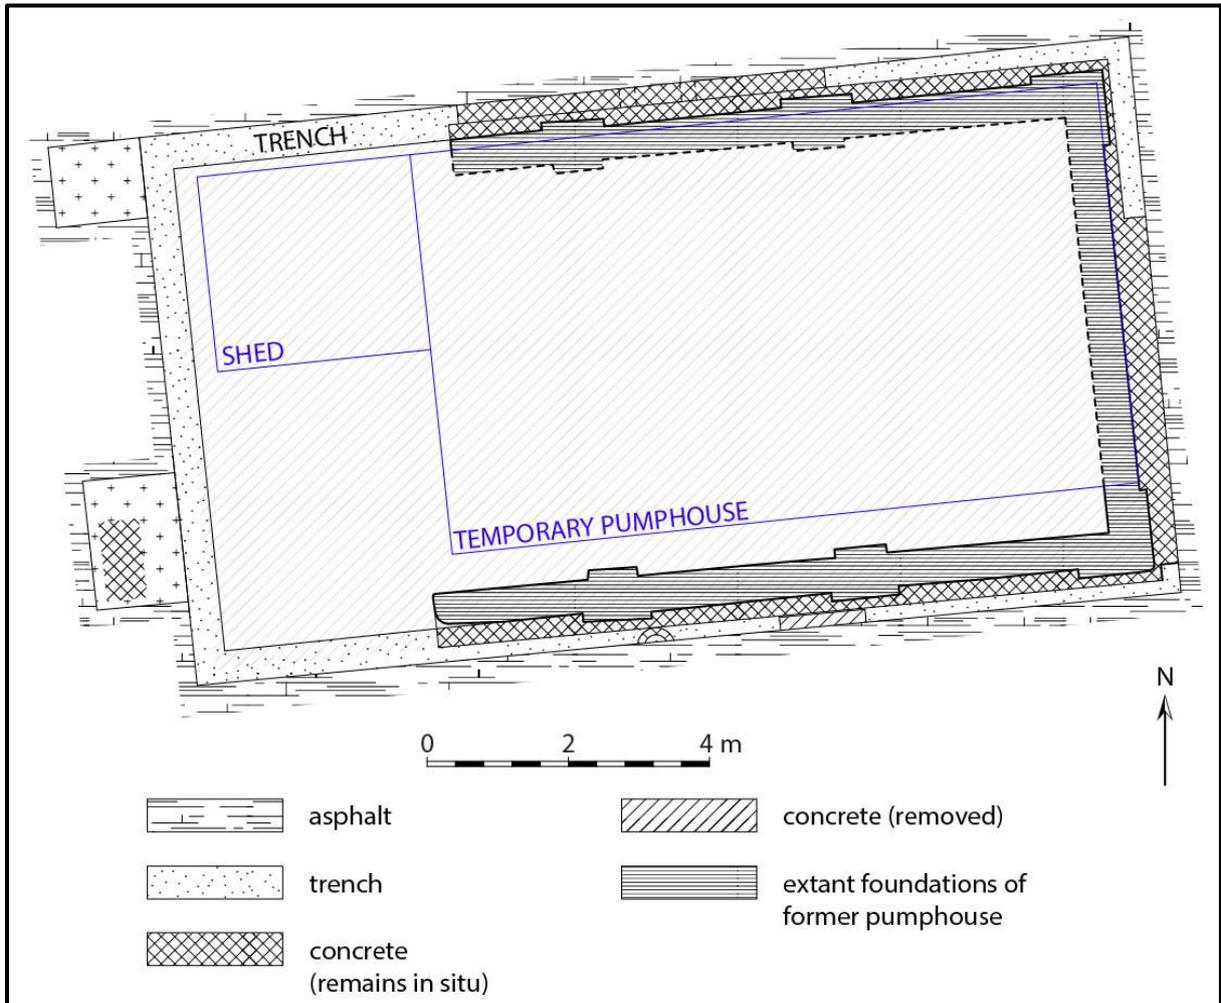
Detail showing the pumphouse foundations and associated earthworks.
